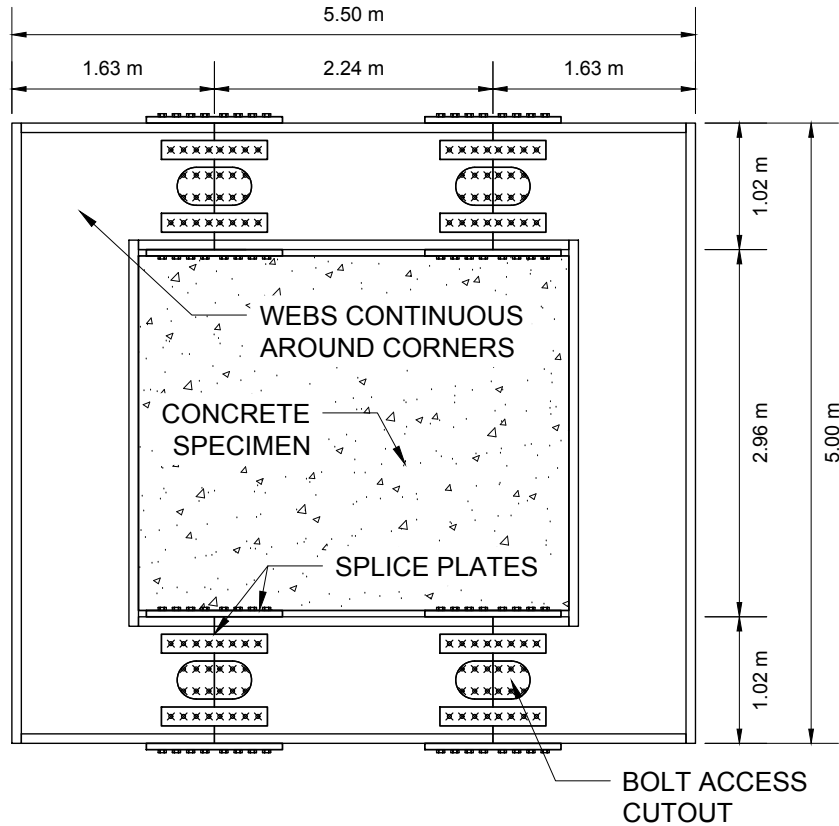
Plan view of assembled steel confinement frame (Hayes et al., 2018).
